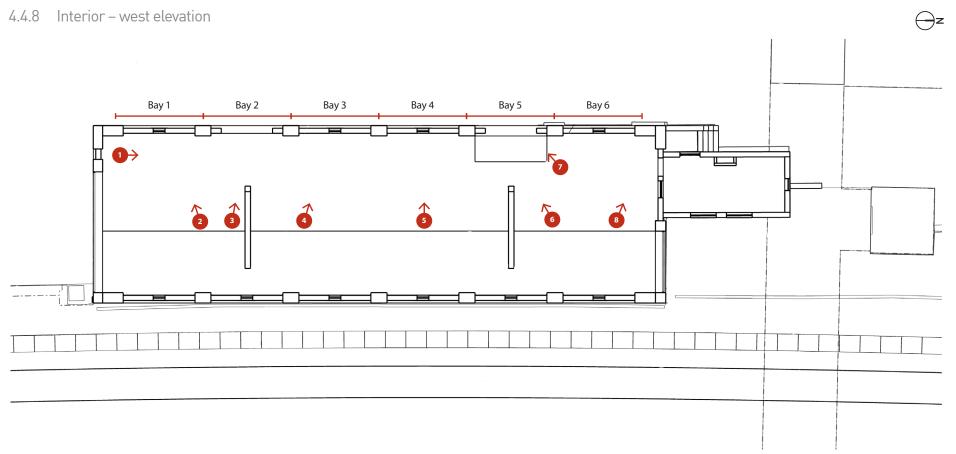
Key plan showing location and direction of photos of the interior west elevation of Goods Shed
